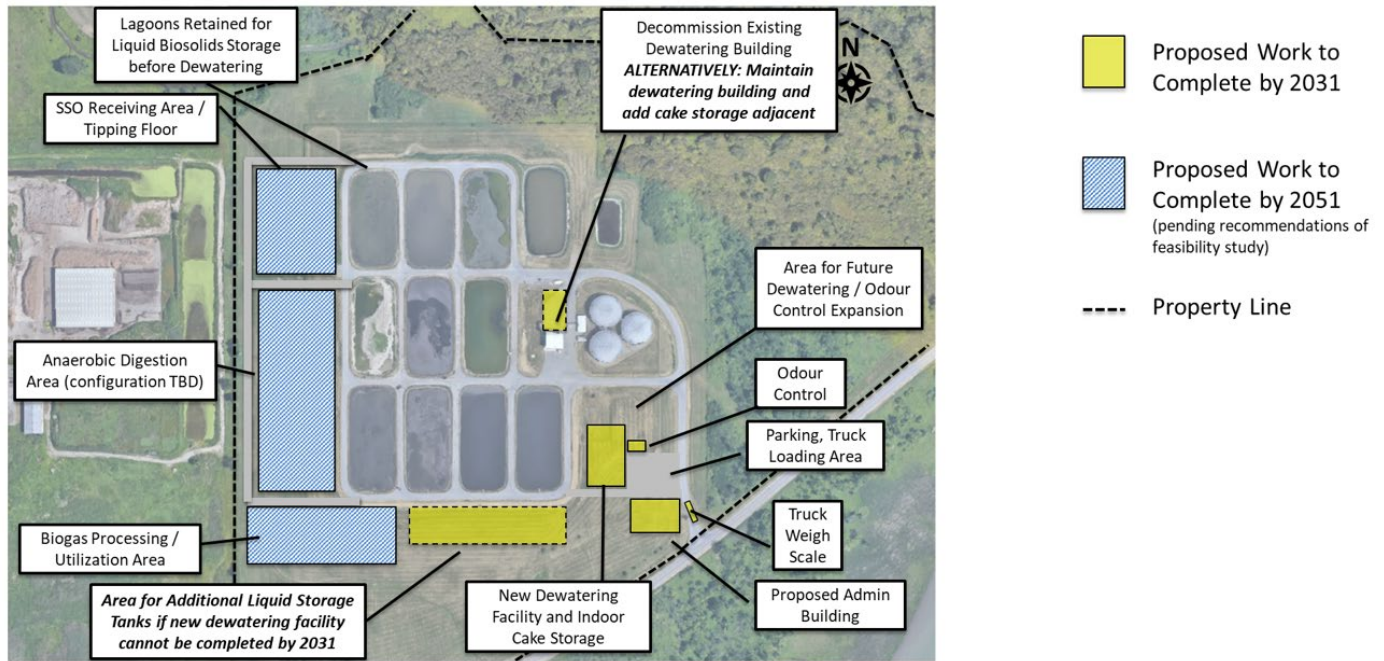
Proposed Build-out of Garner Road Biosolids Facility
